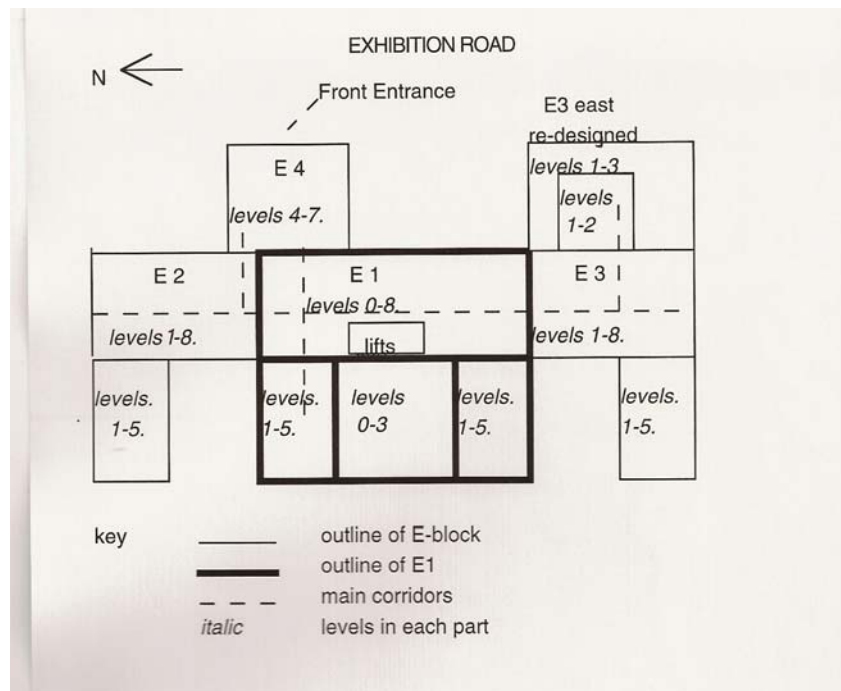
Schematic of the new Mechanical Engineering building, E-block, as built from 1955 -1967 in four stages, E1 to E4
